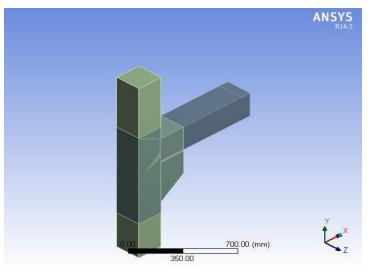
ANSYS Modeling for Precast Beam-Column CFRP Wrapping Connection
